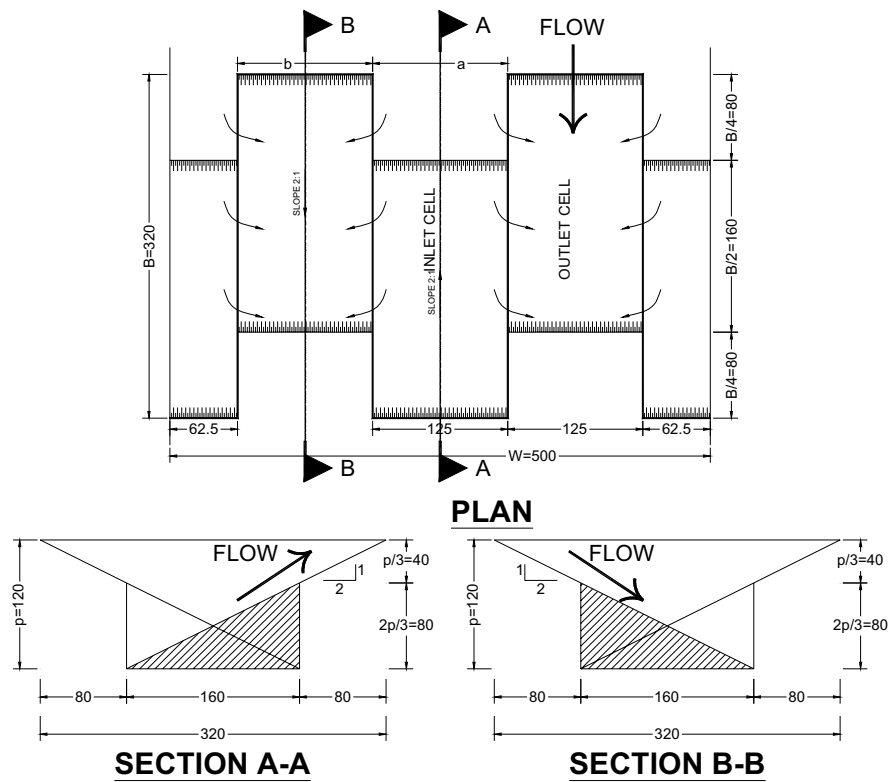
Plan and section of model P₂M₄ (both sides ramping), (dimensions in mm)
